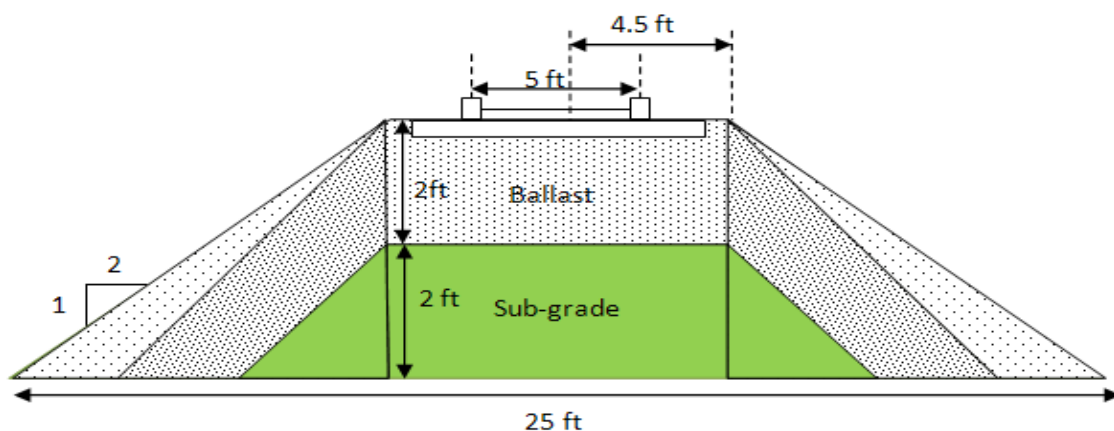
Schematic of the unreinforced railroad cross section (not to scale)
